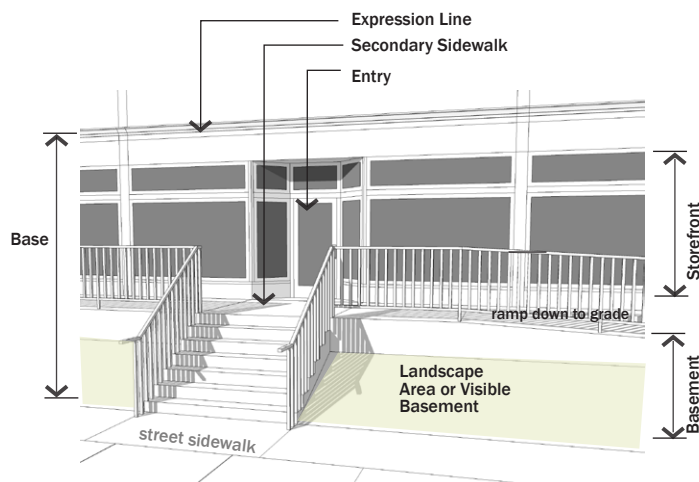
I (2). Elevated Storefront Entrance Type.
